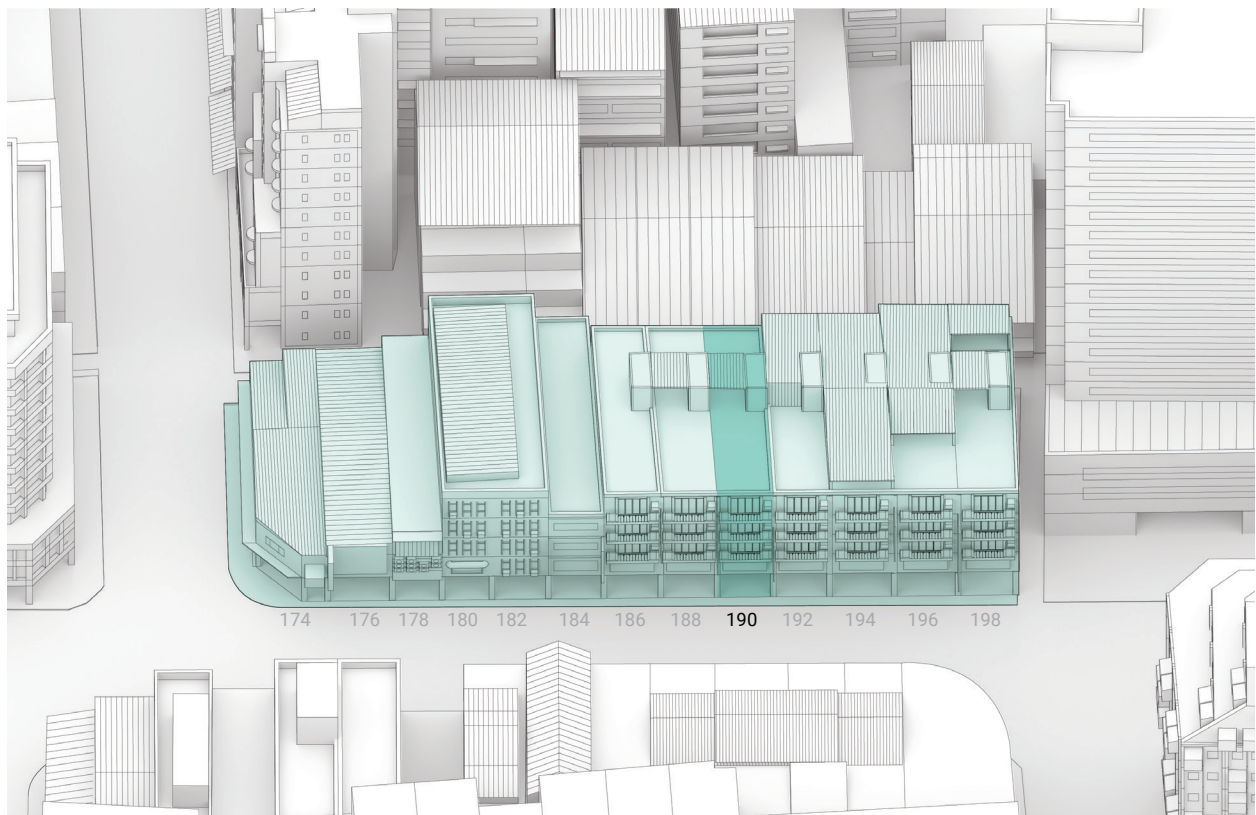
The project site is at the intersection of Section 2, Yanping North Road, and Guisui Street. Streethouse No. 190, which is highlighted here will be used as a case study in the following sections.
